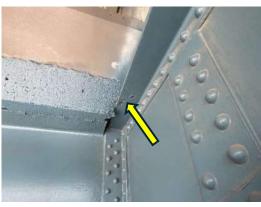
W-002: Areas of 100% section loss in top flange of FB0 south overhang, at RS2, looking south
